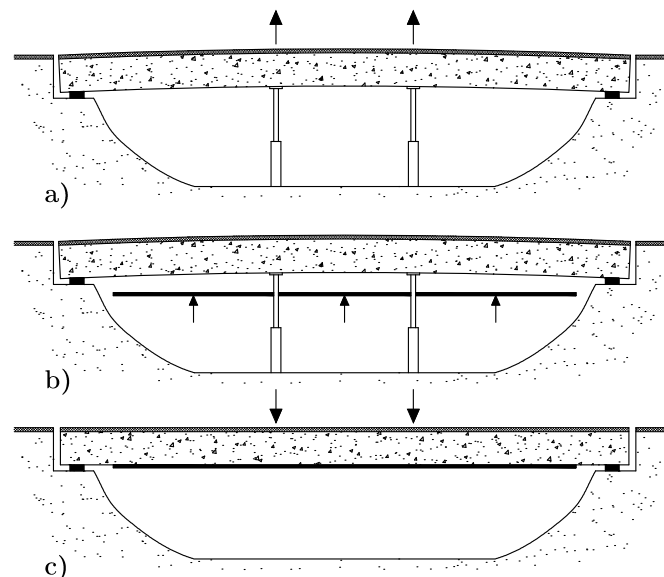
Field application with cambered beam system, a) cambering of the beam using hydraulic jacks, b) application of prestressed CFRP-laminates, c) after the hydraulic jacks has been removed.
